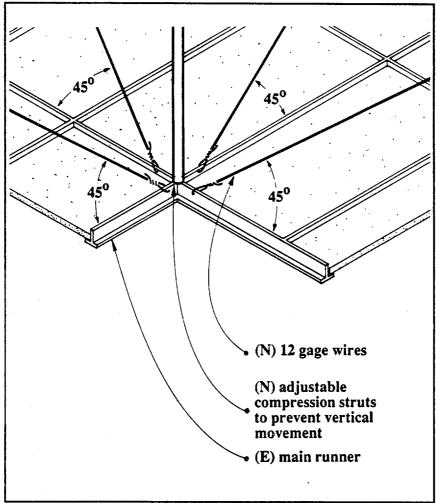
Lateral bracing of a suspended ceiling.
